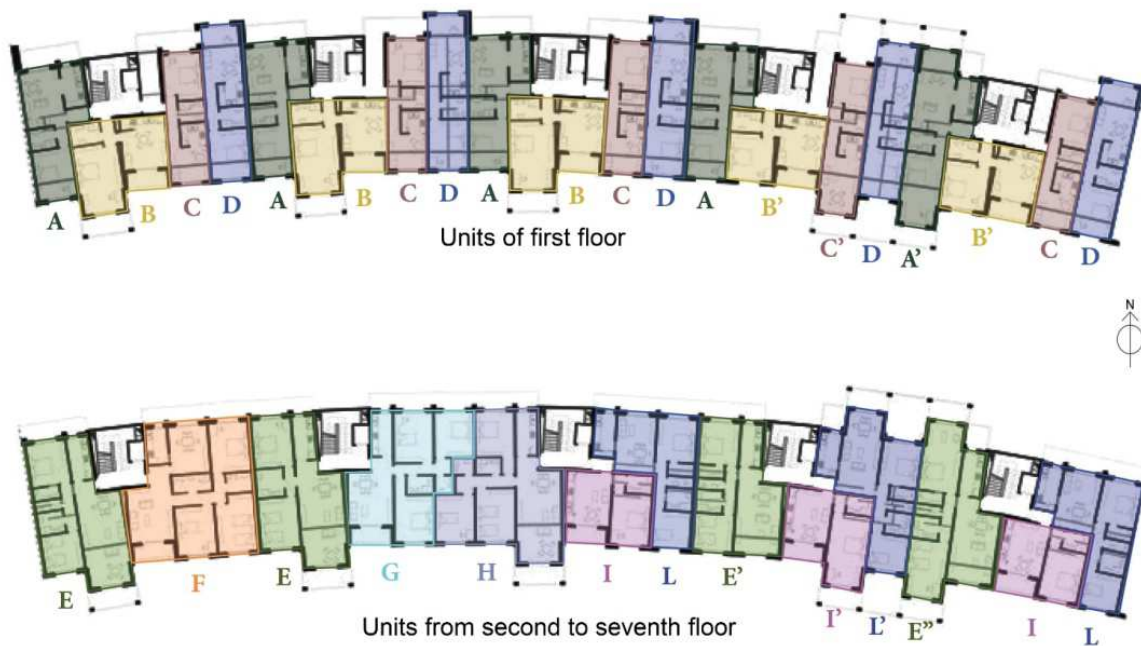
Plans of the case study, adapted from Copiello and Bonifaci [10], p. 80
